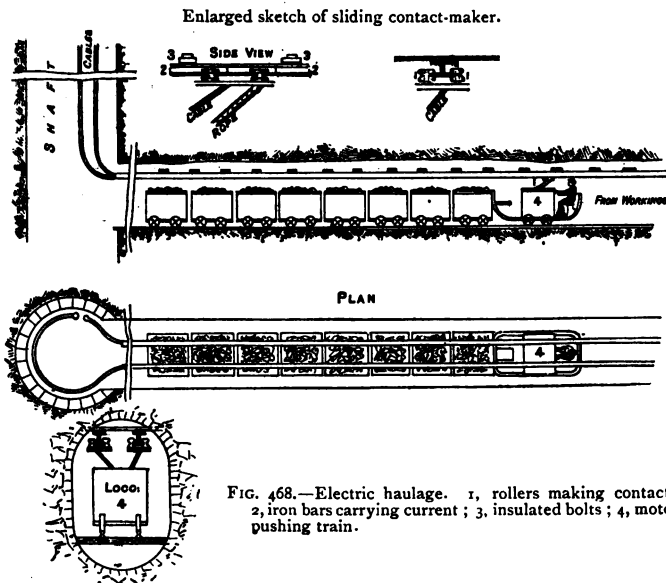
Electric haulage. 1, rollers making contact; 2, iron bars carrying current; 3, insulated bolts; 4, motor pushing train.
